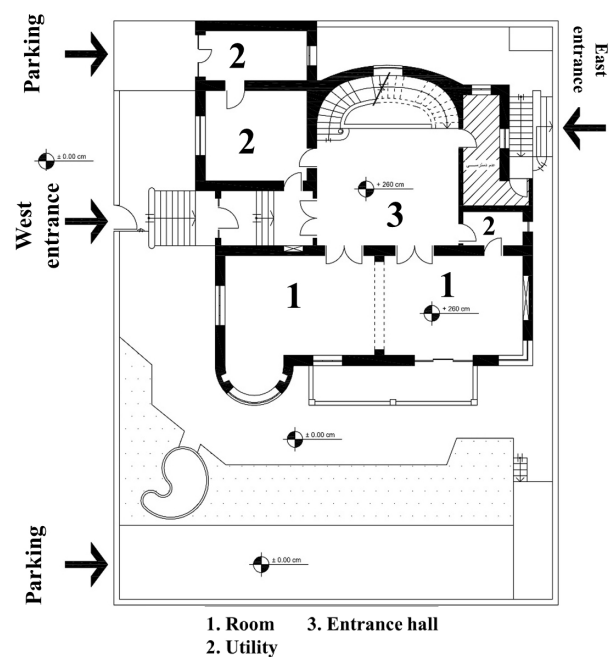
Ground floor plan (1/250) of the House No. 6. Source: Authors.
